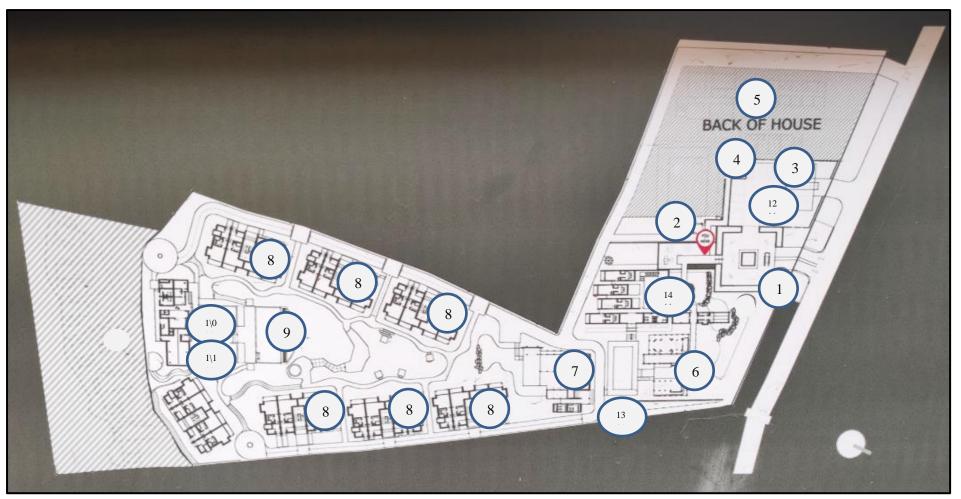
Layout Plan of Zwekapin Valley Resort and Spa
